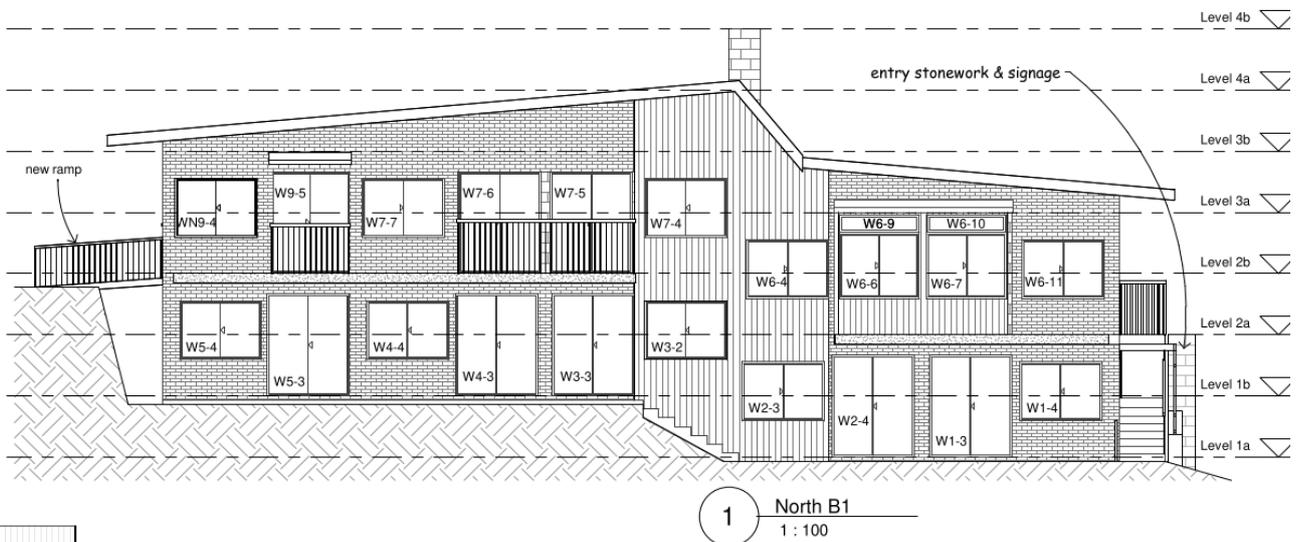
Proposed northern elevation Building 1, including elevated ramp
